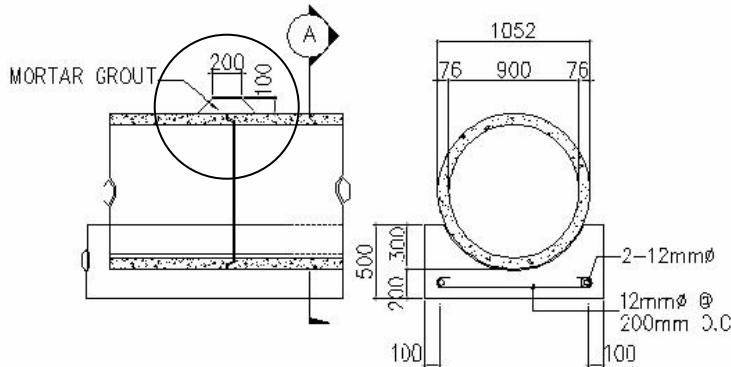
Detail of Pipe RC Bedding as per Plan
